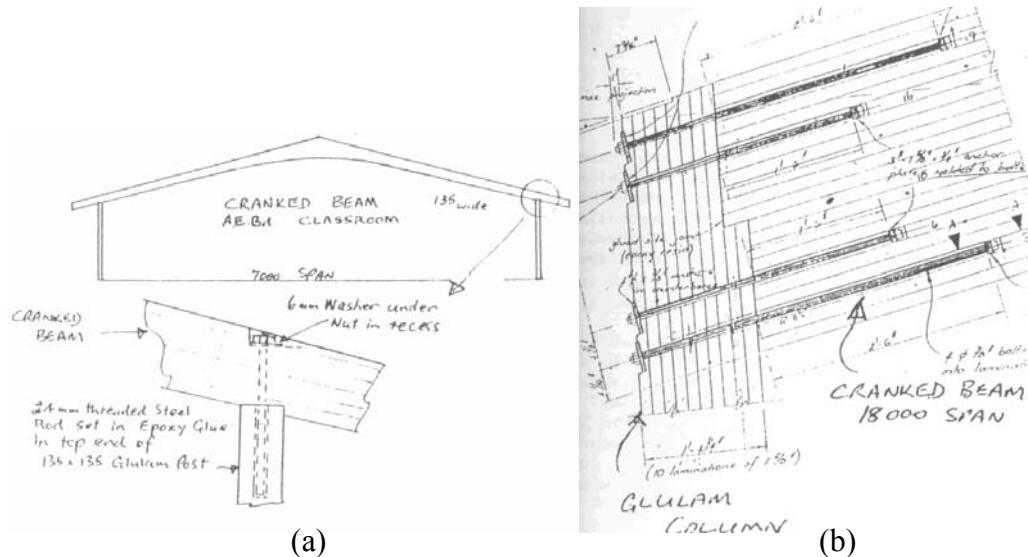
(a) Auckland Education Board classroom detail and (b) Te Awamutu College gymnasium knee joint detail (Reproduced from McIntosh, 1989)
